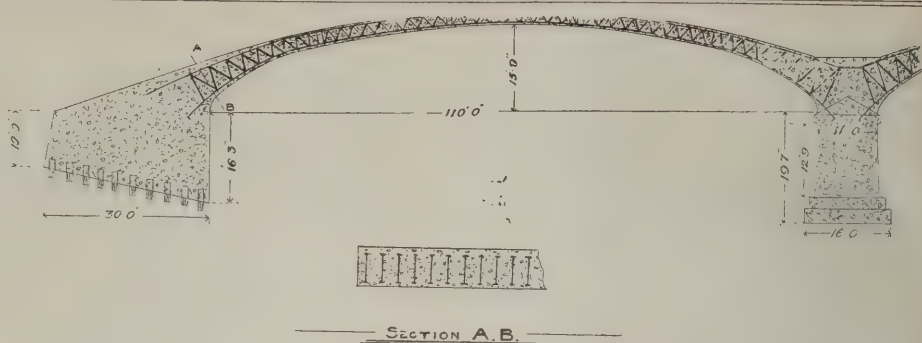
REINFORCED CONCRETE BRIDGE OVER JEFFERSON STREET, INDIANA.
